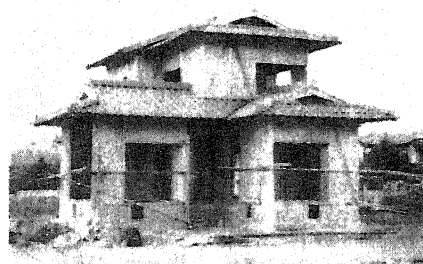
Typical Japanese house under construction, note heavy roof, etc.
